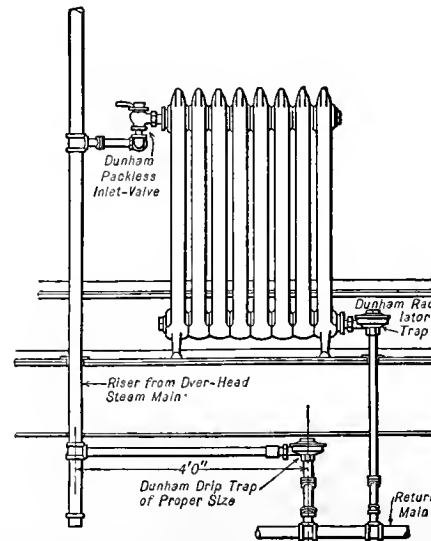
DETAIL No. A, SHOWING METHOD OF DRAINING END OF STEAM MAIN WHEN RETURN LINE IS BELOW STEAM MAIN.
